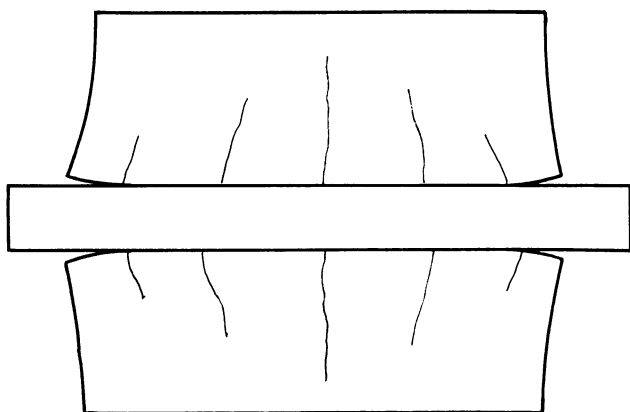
Deformed concrete between transverse cracks, showing internal cracks
